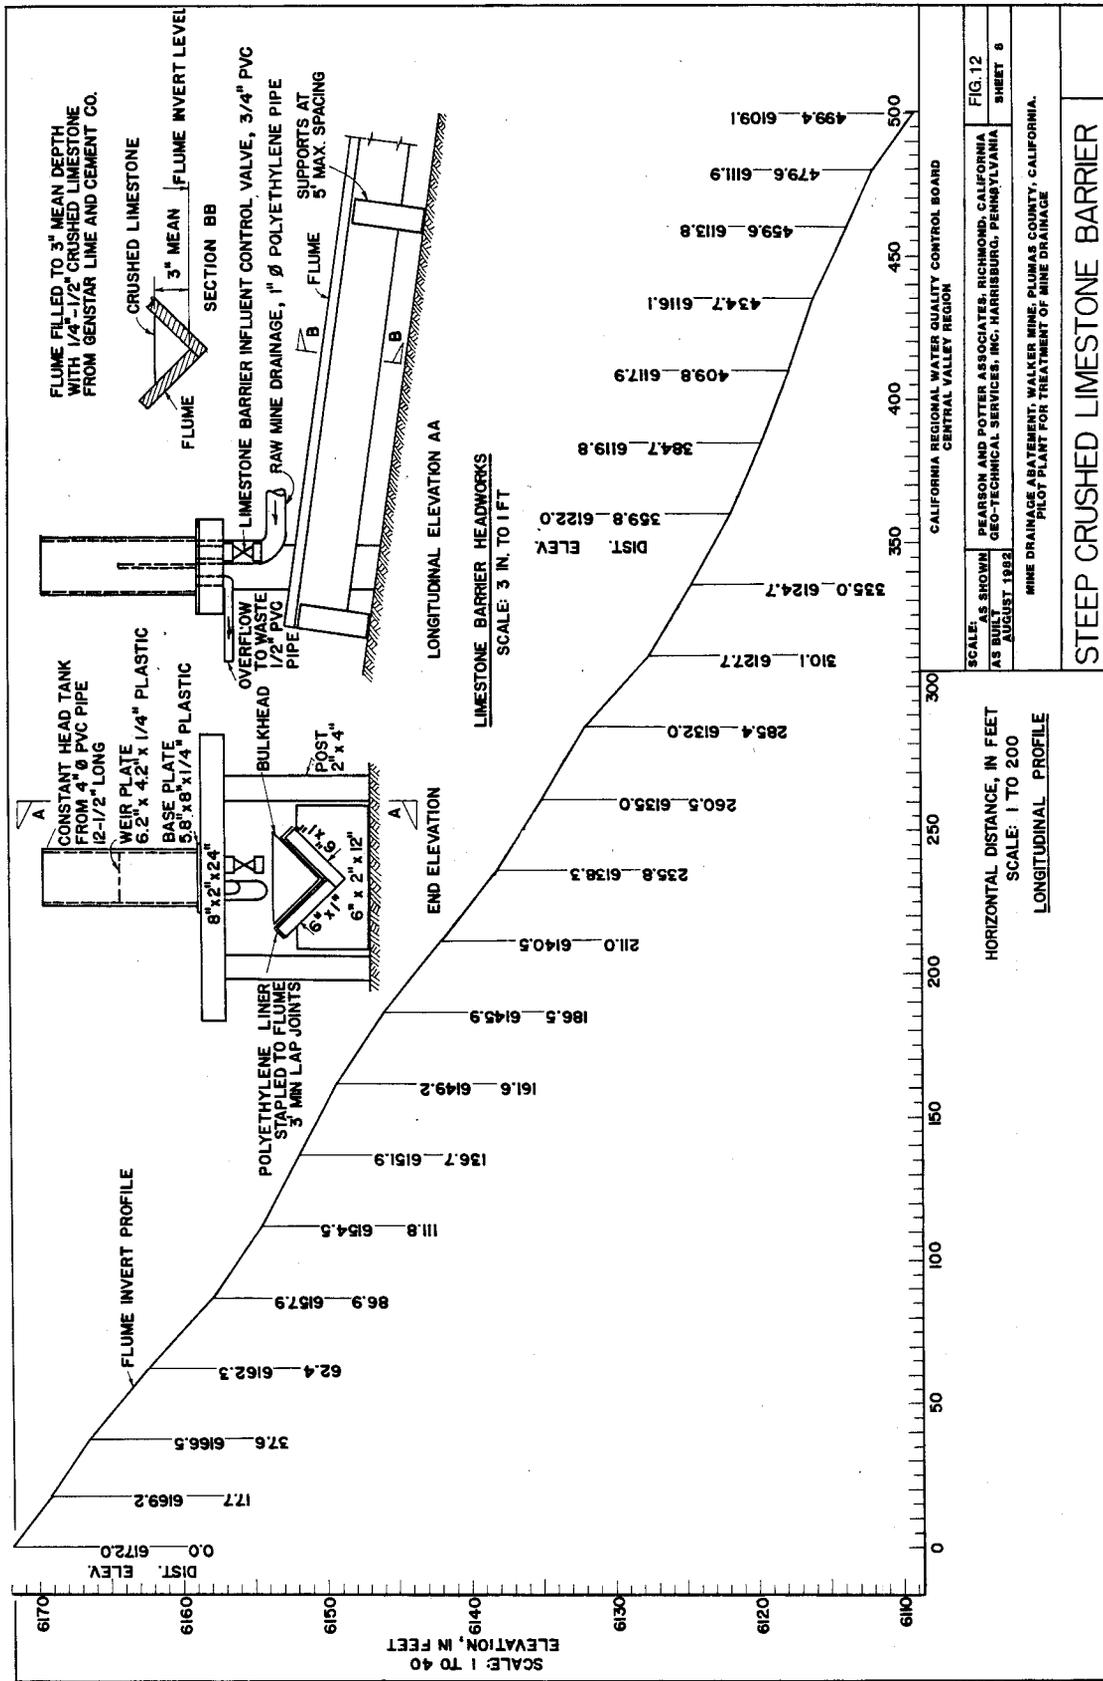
Steep Crushed Limestone Barrier (As-Built Construction Drawing Reduced to 25% Size).
